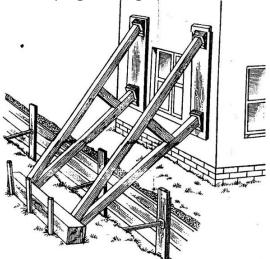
Excavations near a building—shoring required to prevent collapse of the building
